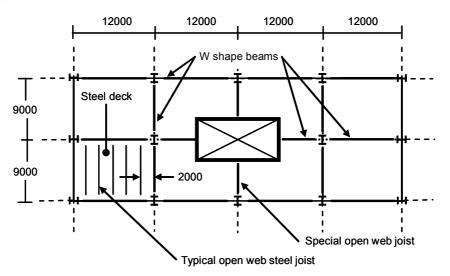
Floor assembly specified at the element level, alternative # 2 (dimensions in mm)
